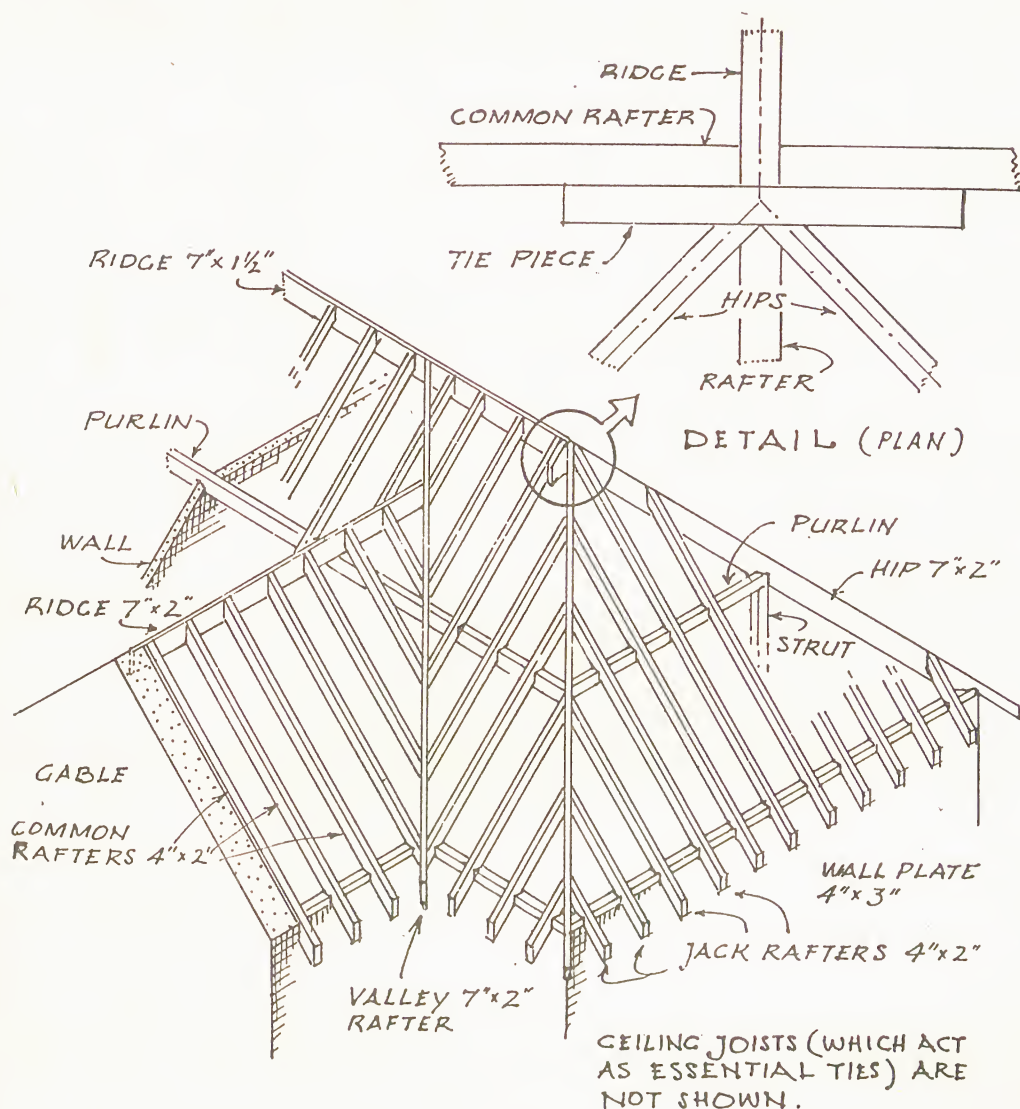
Typical hipped roof with secondary gabled roof and valley junction.
